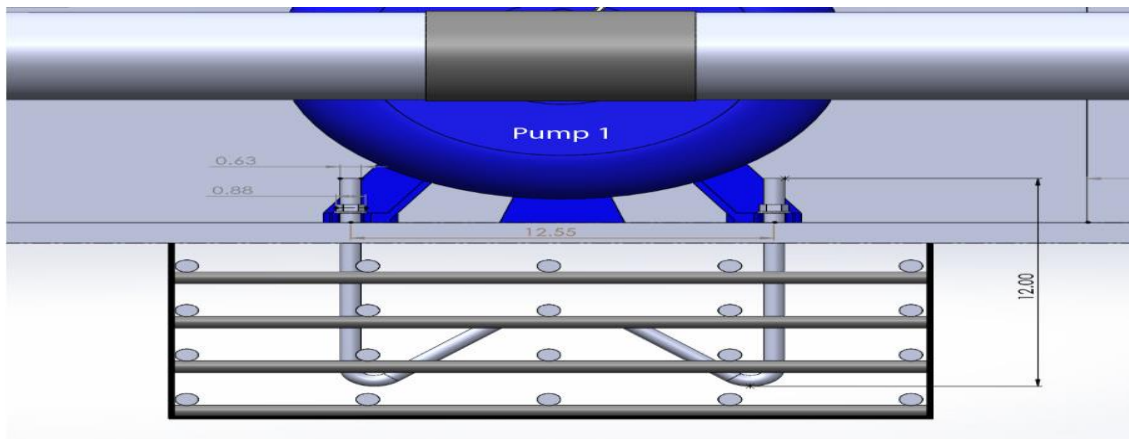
Dimension of the Pump anchor bolt (Pump base cross sectional view)
